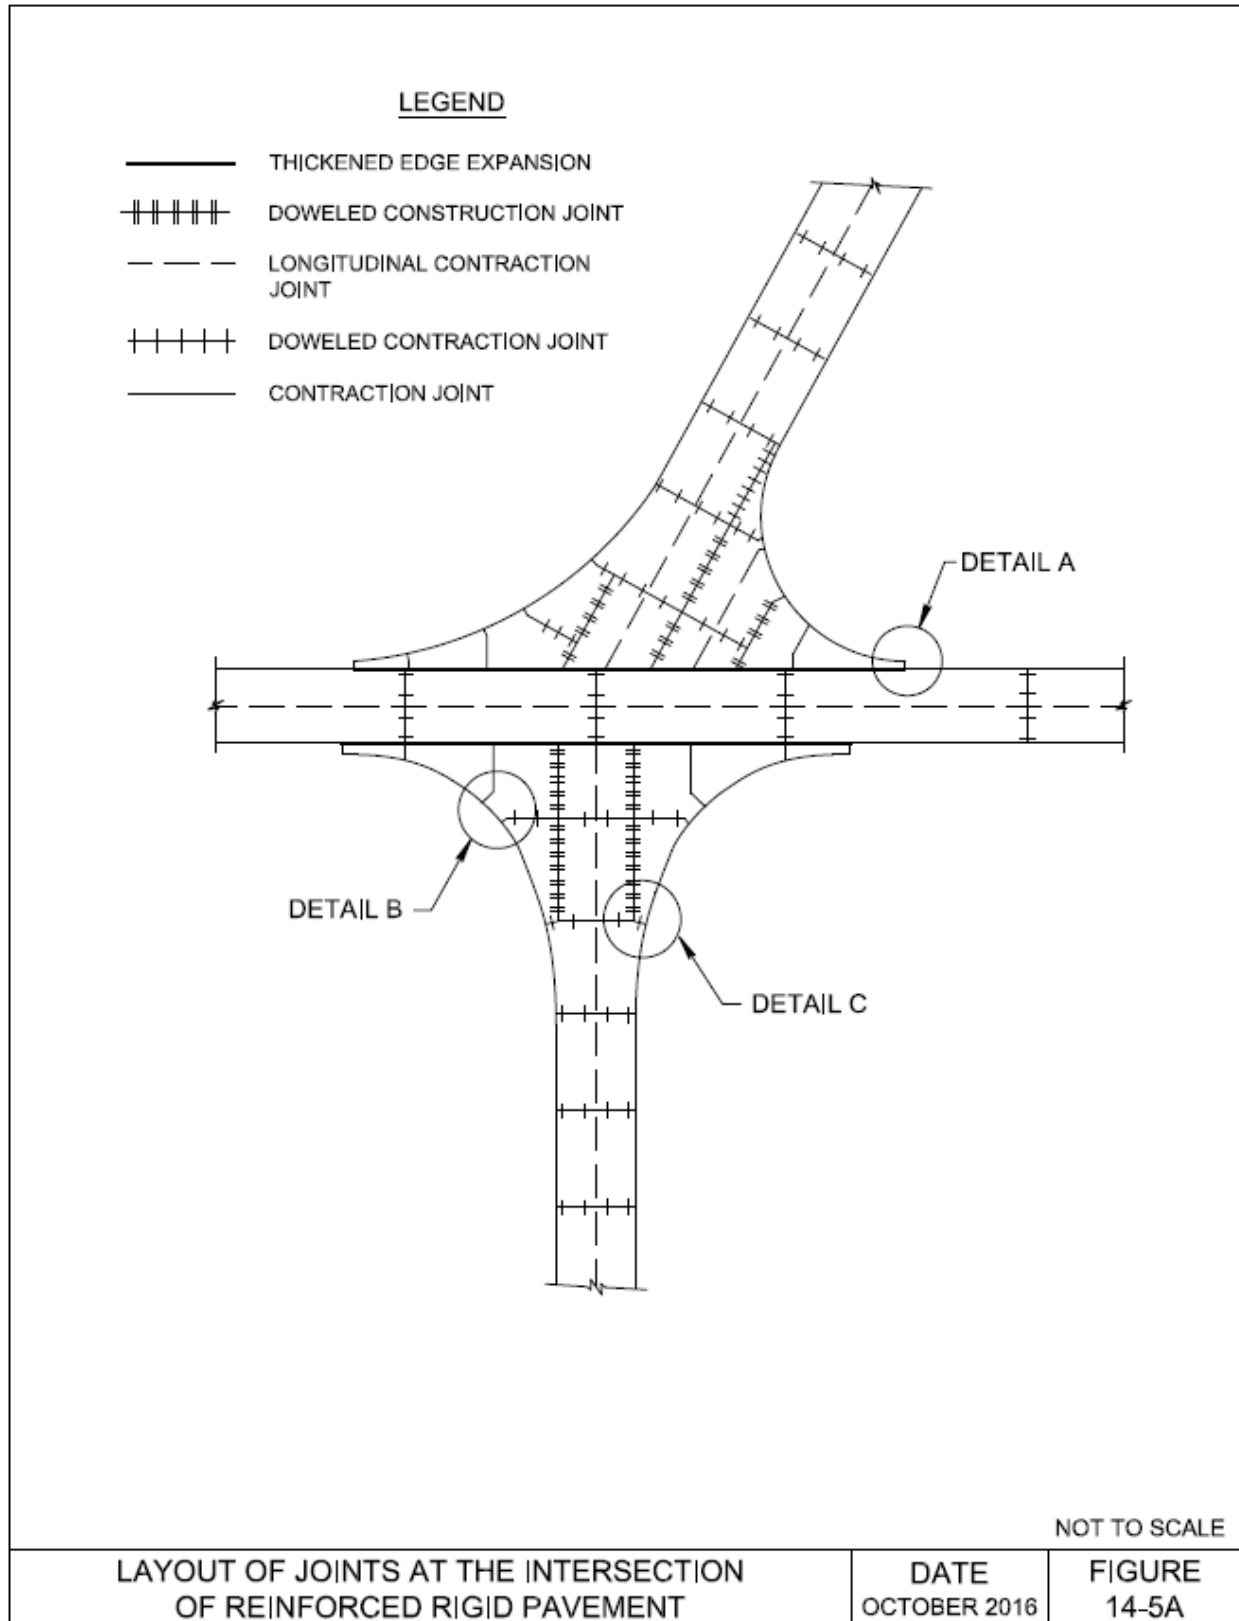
B Layout of Joints at the Intersection of Reinforced Rigid Pavement
